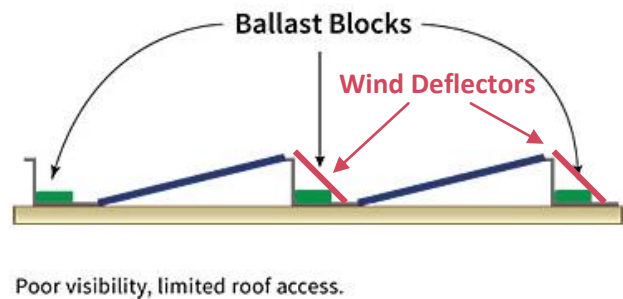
Ballast mount solar system (Roofing Contractor, 2014)
